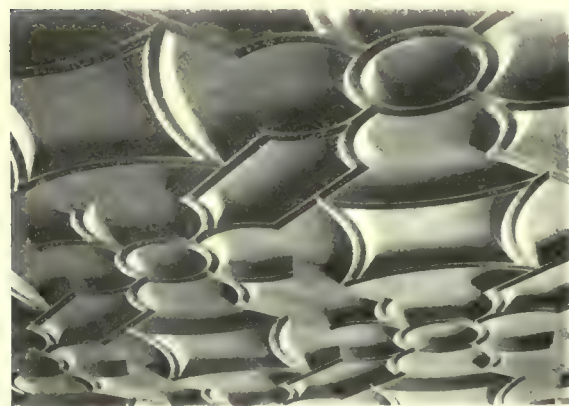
Modern Ceiling of Hall at Brickwall, Northiam, Sussex.
